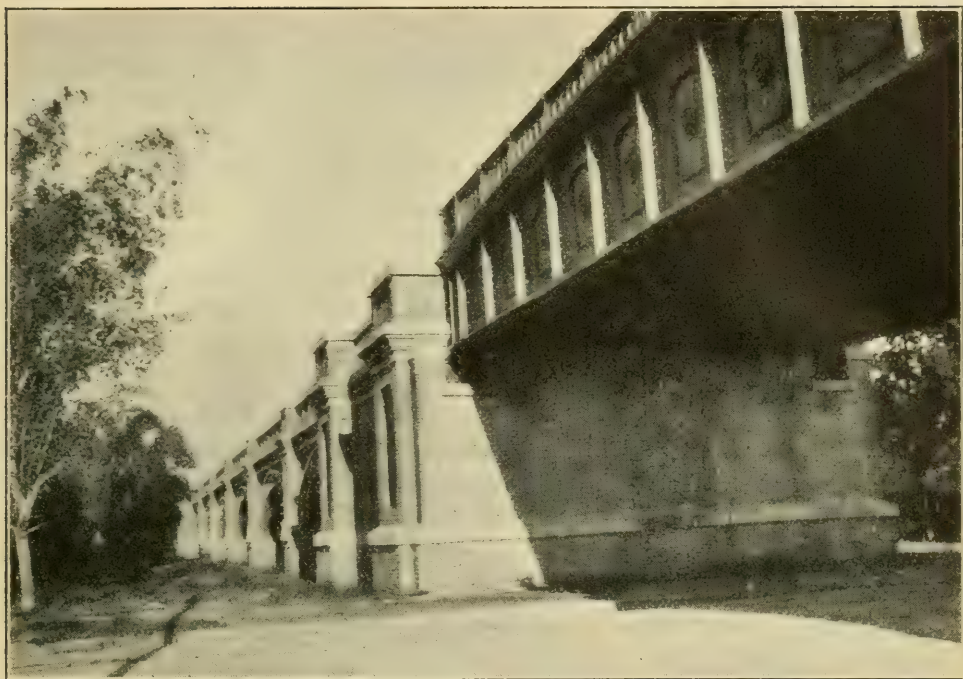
STEEL BRIDGE AND MASONRY VIADUCT, CENTRAL ARGENTINE RAILWAY, ENTERING BUENOS AIRES.
